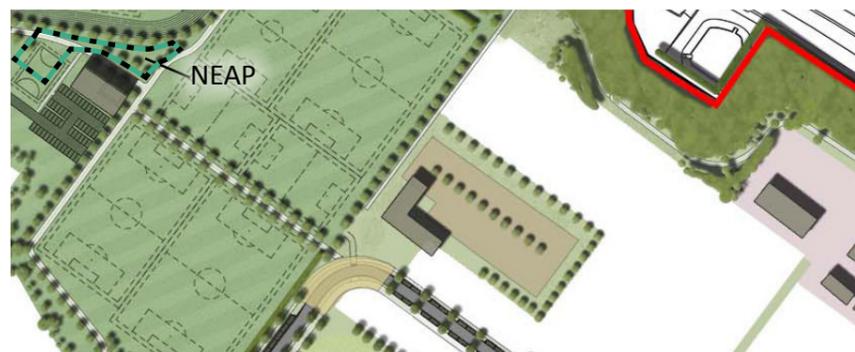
Landscape set-piece: Sheepfold Green (see section 4)
